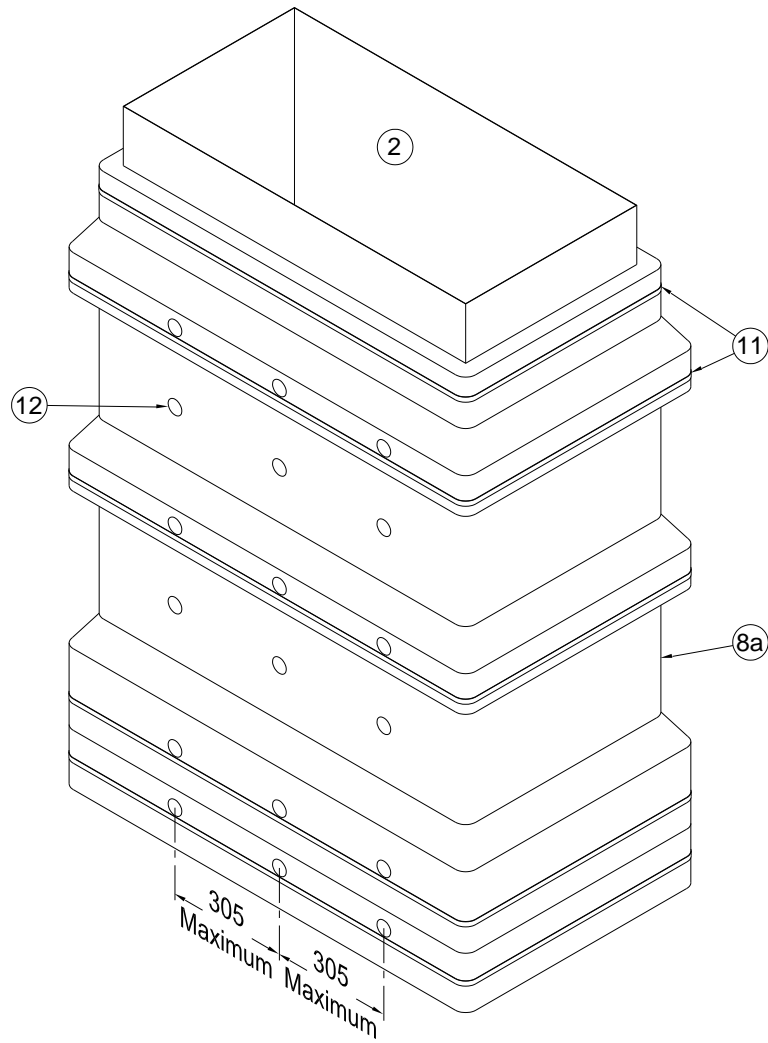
Detail Showing Fire Barrier Duct Wrap 615+ Overlap & Banding
